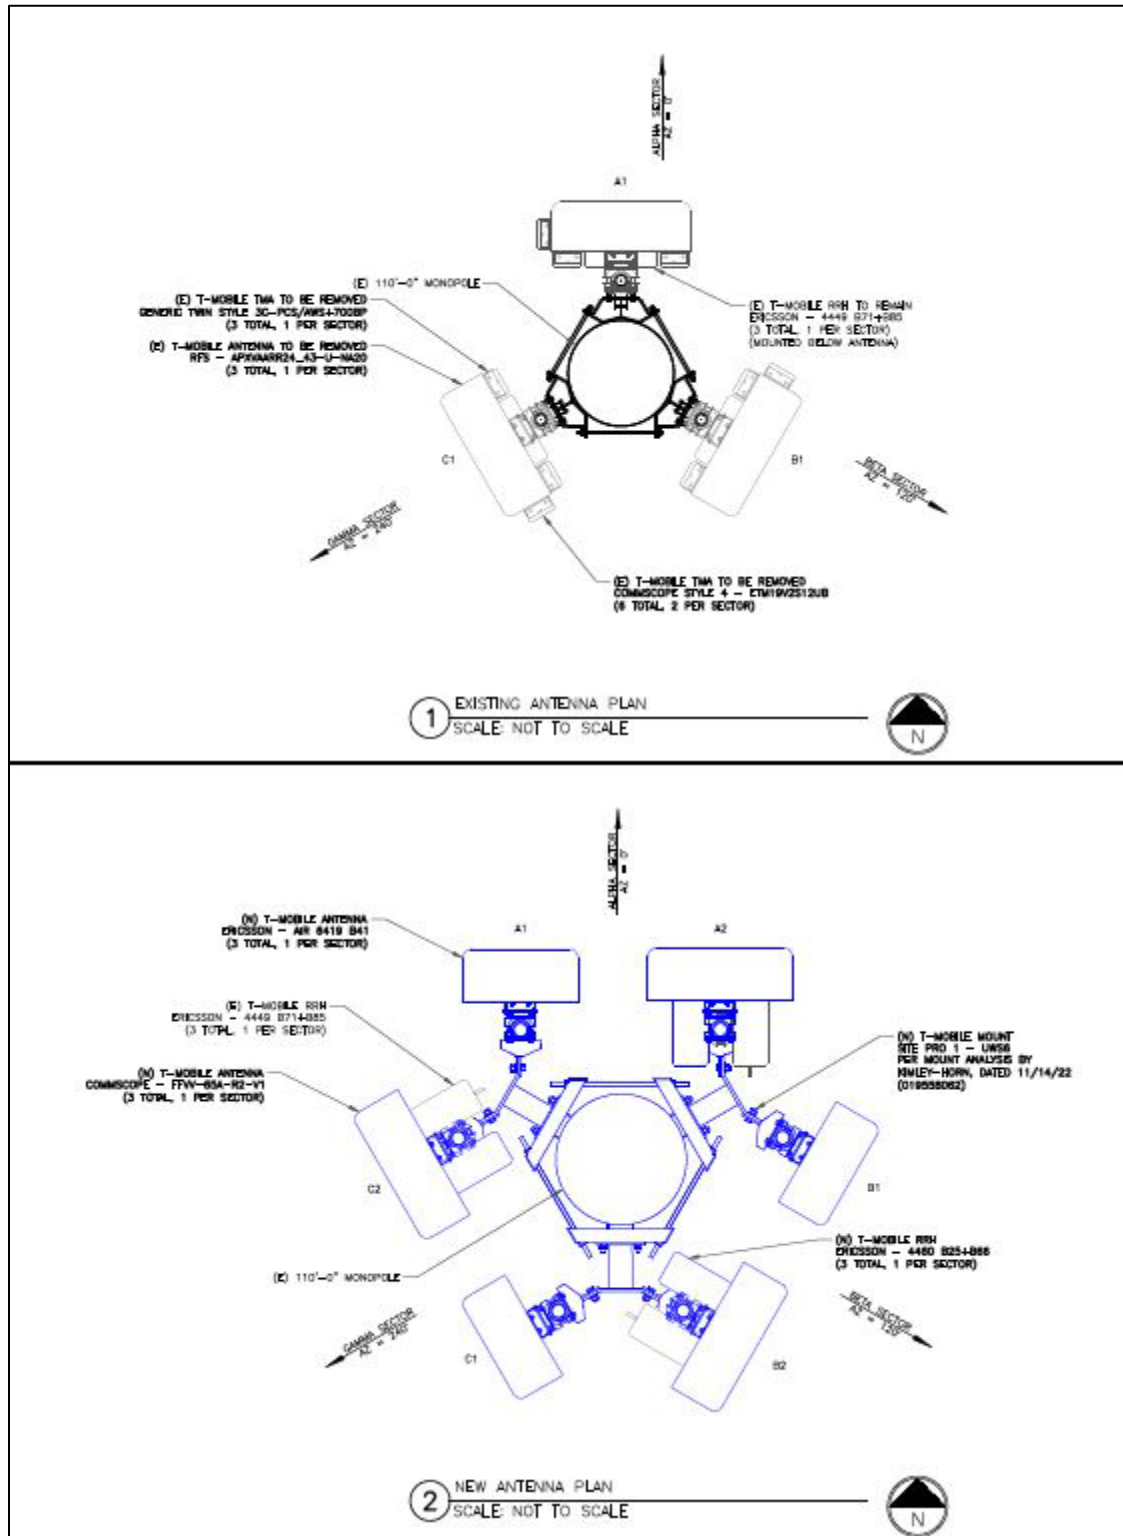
Existing and proposed antenna configuration (Source: Plans, page C-3, panels 1 and 2).
